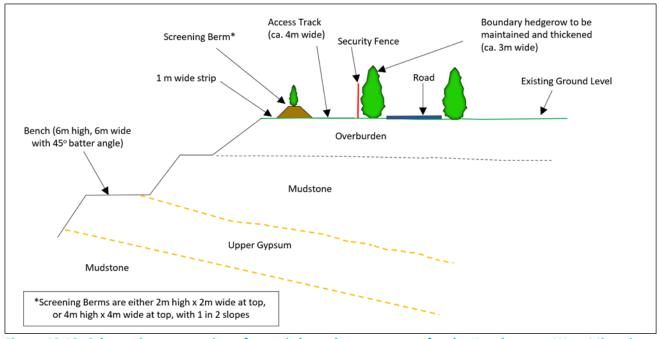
Schematic cross-section of generic boundary treatment for the Knocknacran West Mine site
